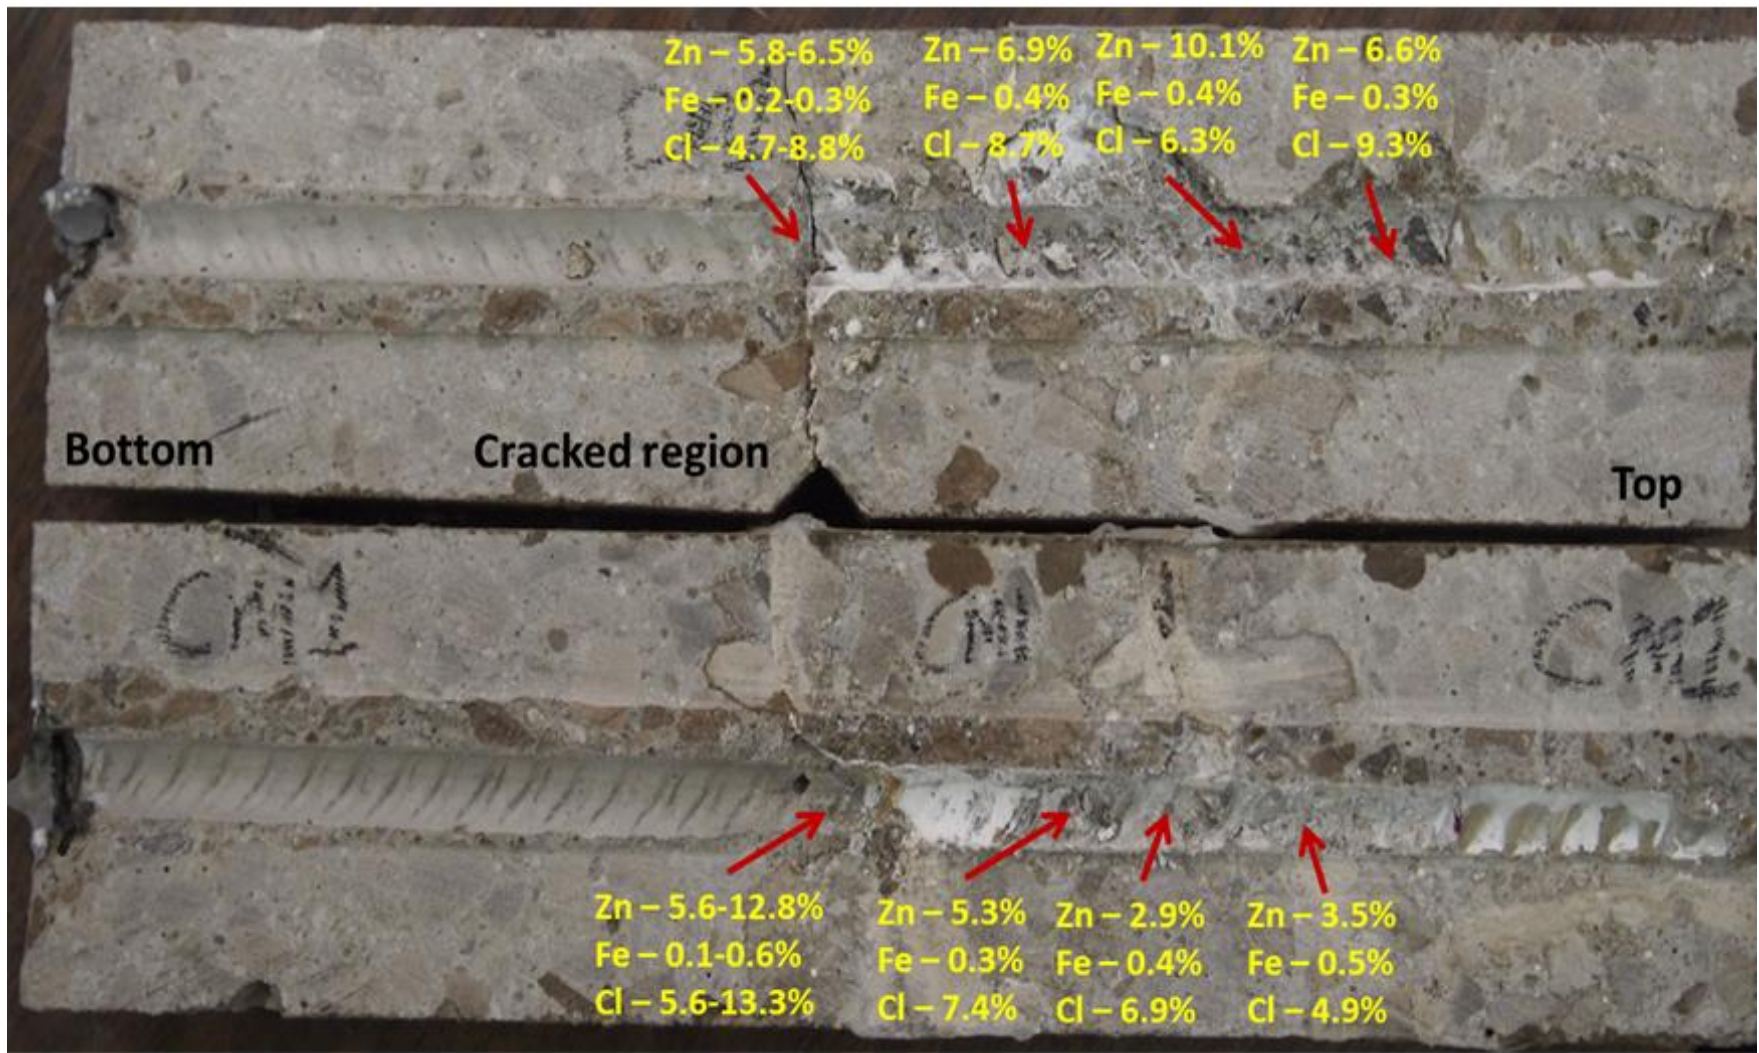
XRF analysis of autopsied transversely cracked C1 concrete specimen
